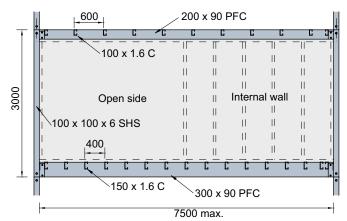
Longitudinal edge beams of an open-sided (corner supported) module
